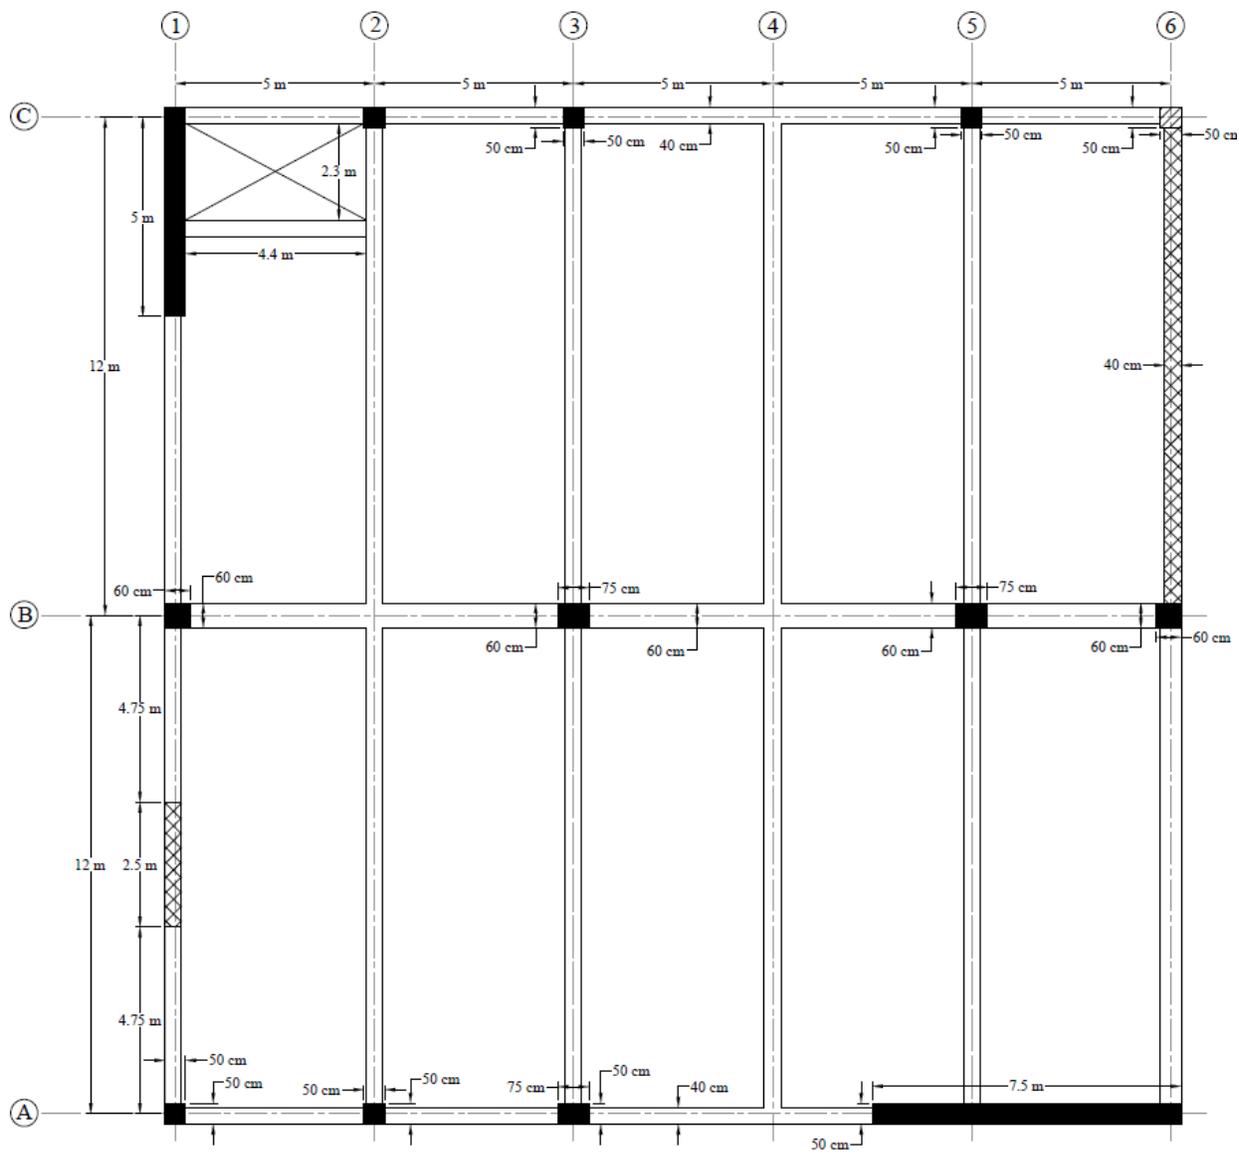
Reinforced Concrete Continuous Beams at intermediate building floor
